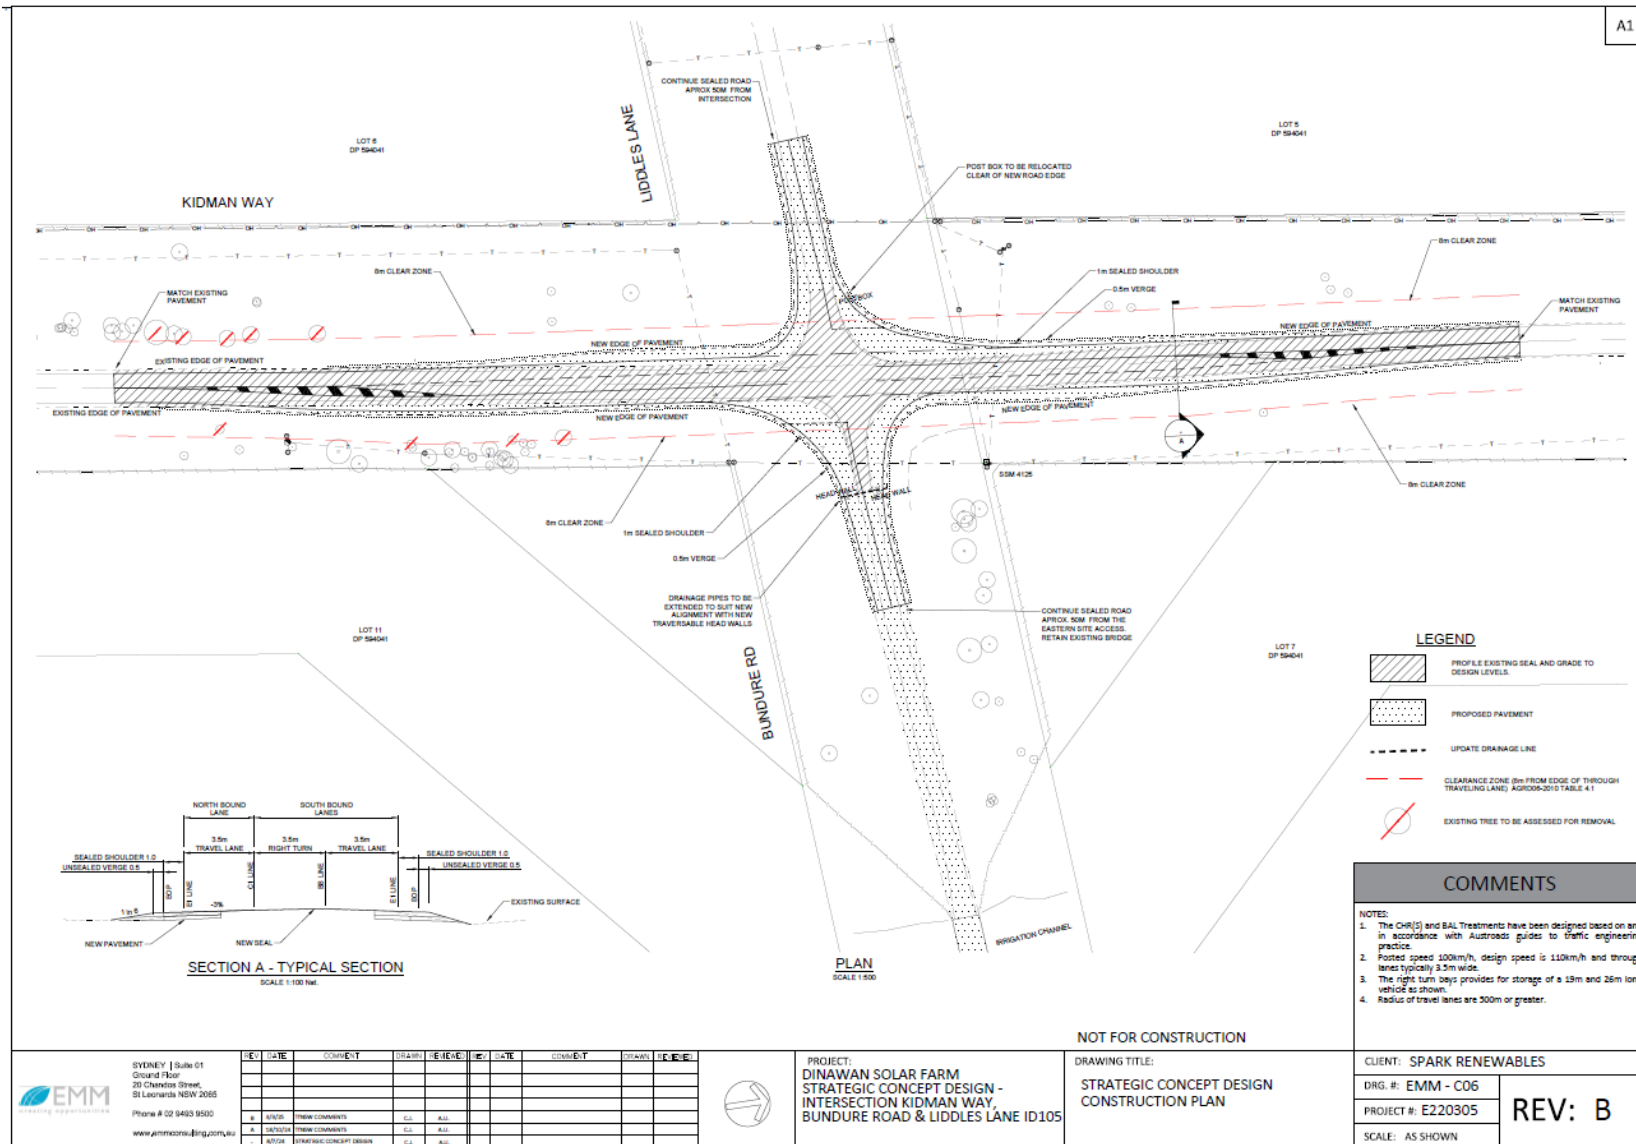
Proposed upgrades at the intersection of the Kidman Way, Bundure Road and Liddles Lane
